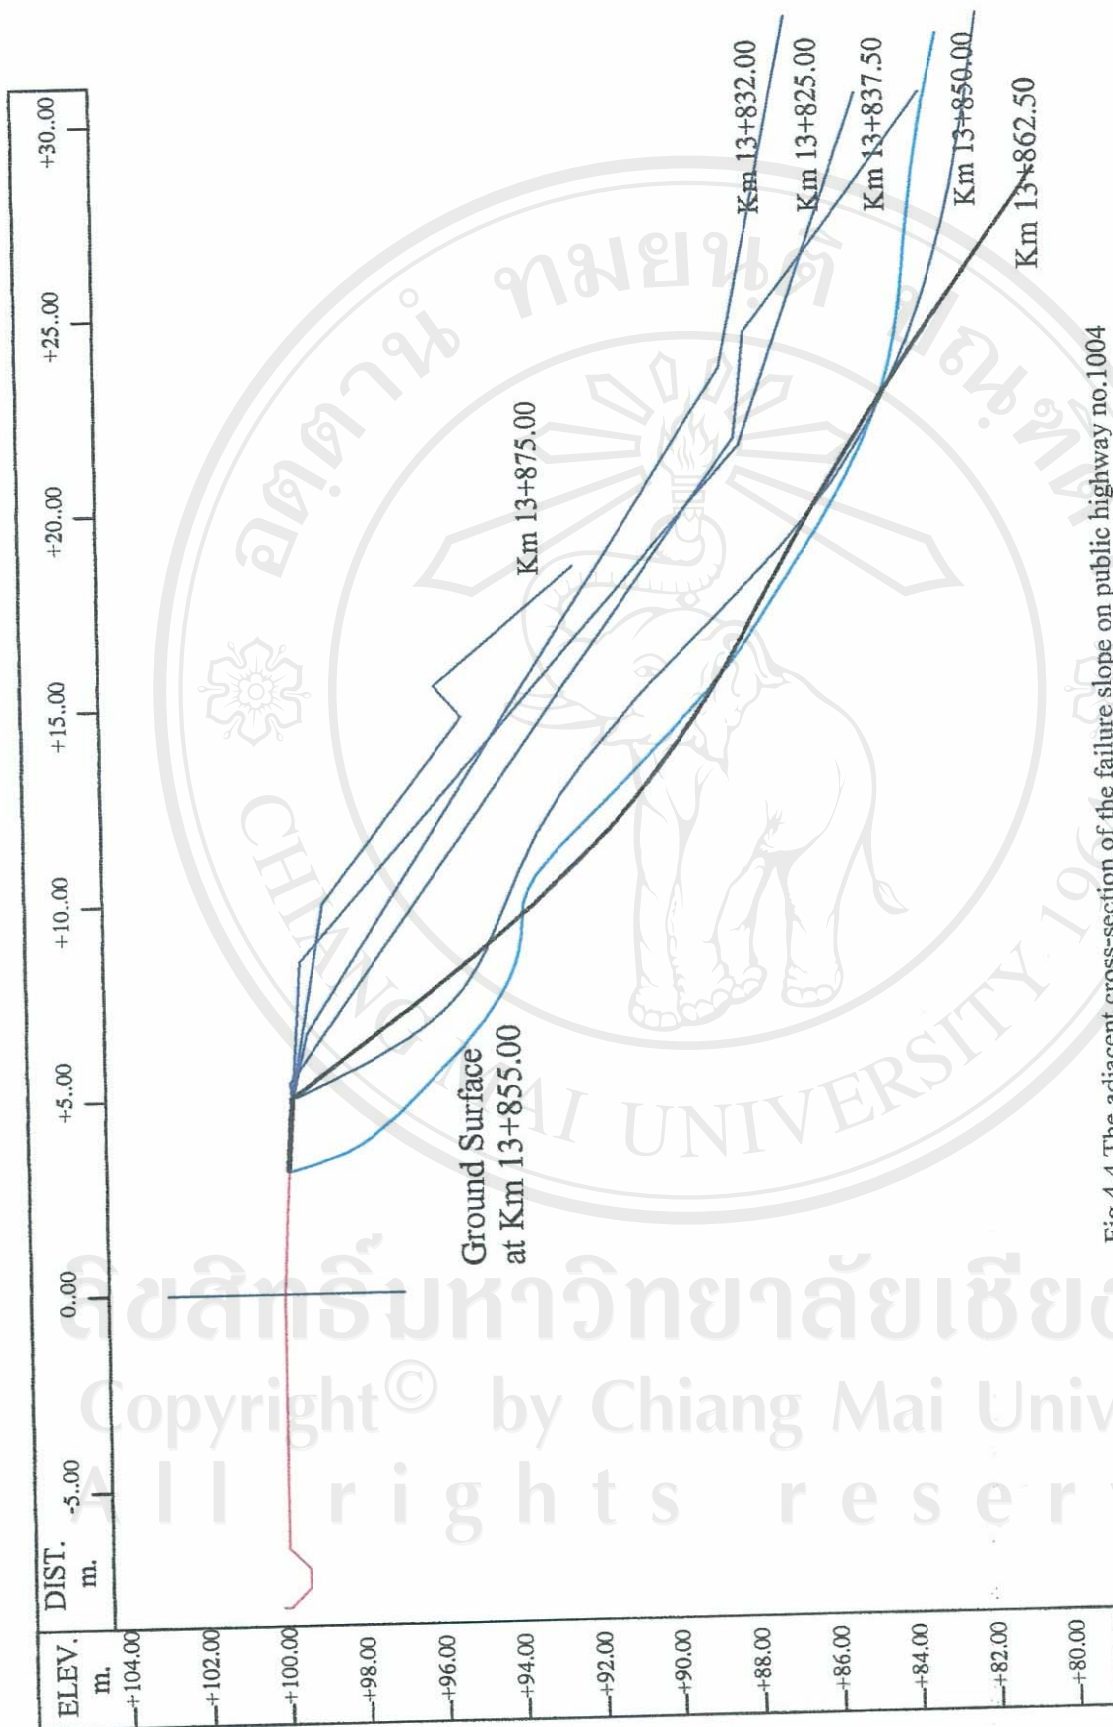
The adjacent cross-section of the failure slope on public highway no.1004
